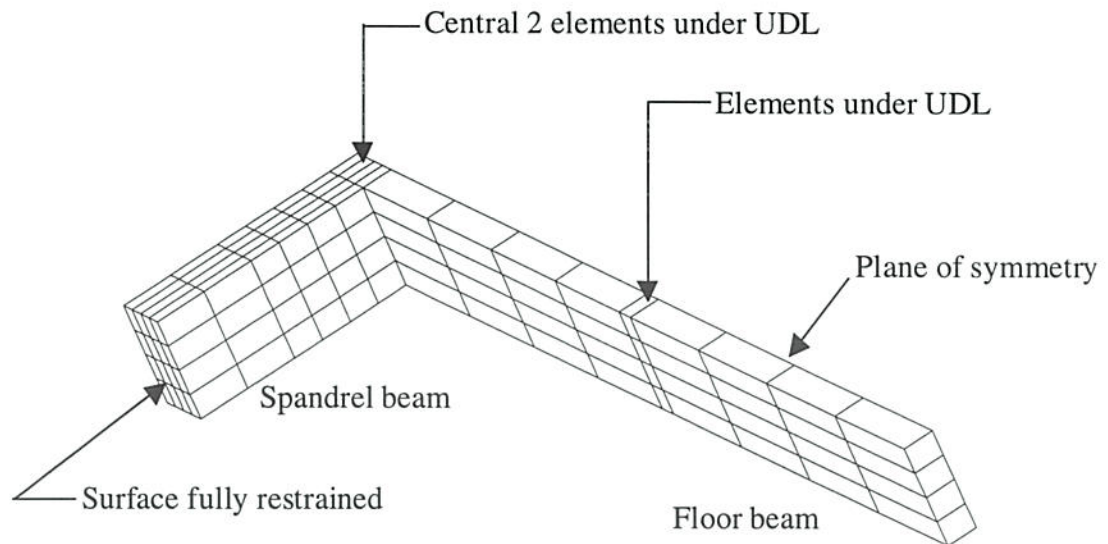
Finite element model of specimen SB-2 (Mansur and Rangan, 1978).
